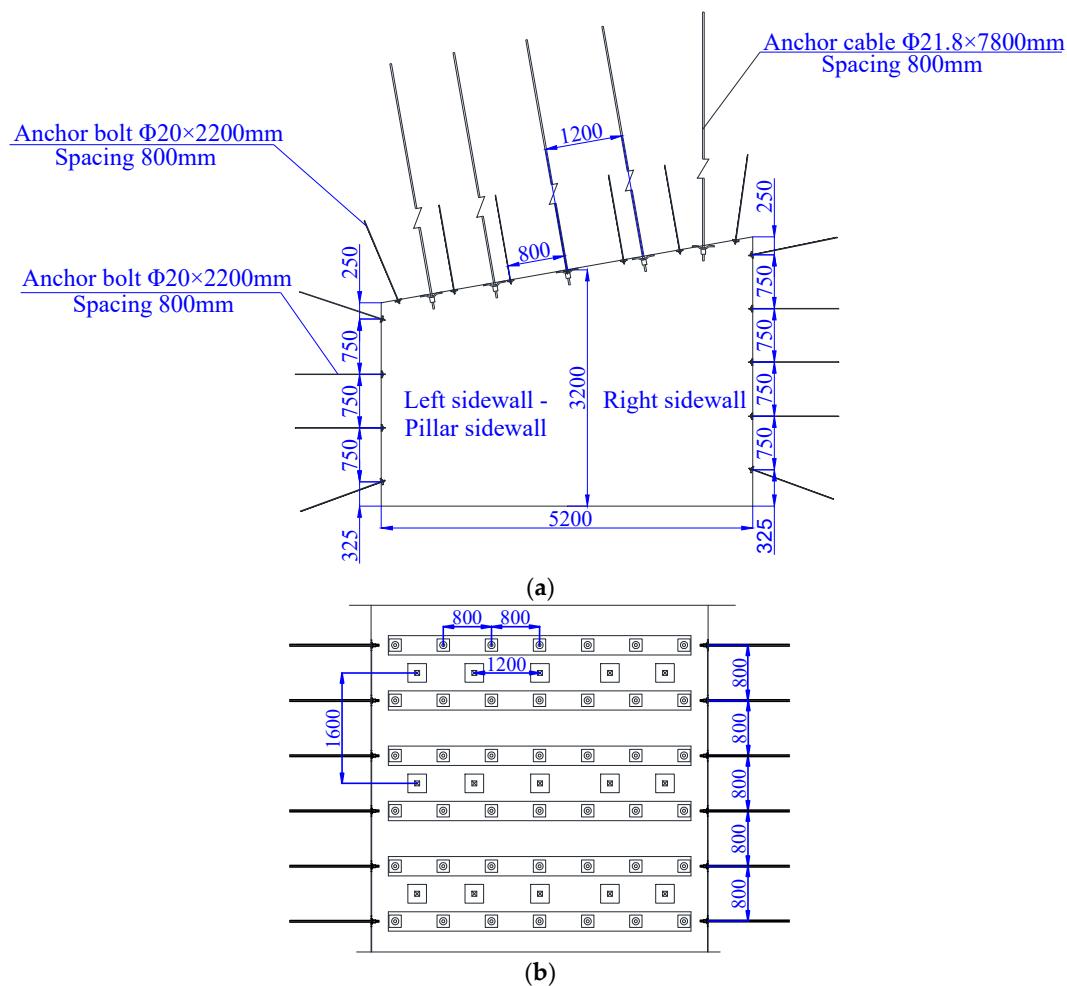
Support parameters for haulage roadway in working face 210106 (unit: mm): (a) section of bolt (cable) support; (b) top view of haulage roadway support.
